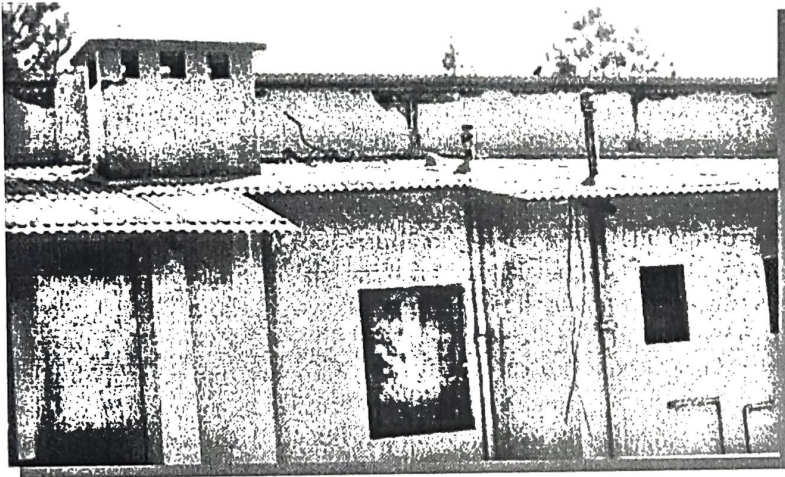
Damage to wall supporting Split Level roof - ITBP campus, Mahidanda.
